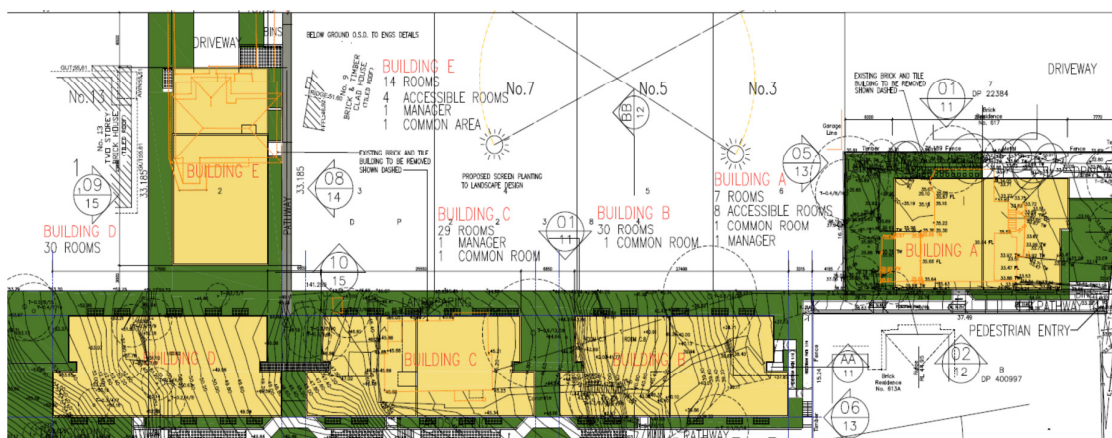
Proposed building arrangement. (Source: Adapted by the author from Plan No. DA-01, dated 5 July 2018 and prepared by Leech Harmon Architects)
